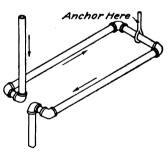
Expansion Joints. Offsets Nearly Horizontal.
